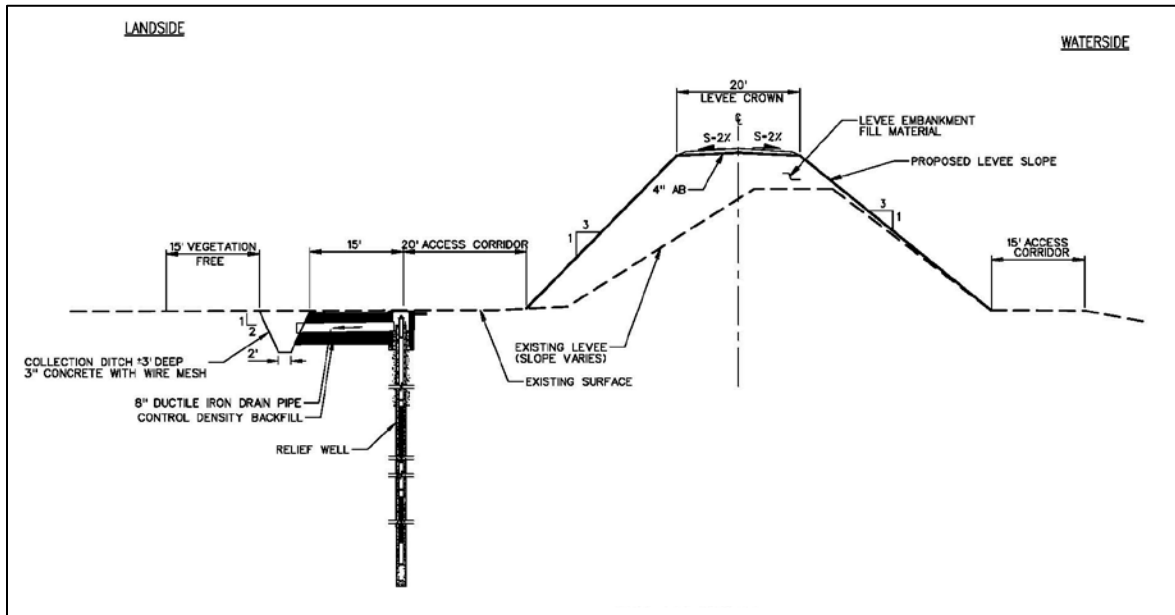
Fix in Place Levee Improvement with Relief Well.
